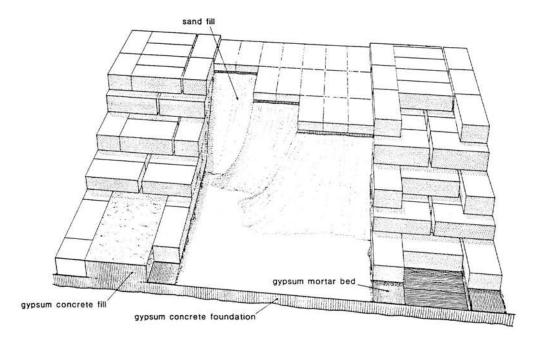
Perspective reconstruction drawing of the foundations of the north and south walls in square AC29, based on observations recorded in Figures 4.5 and 4.6.
